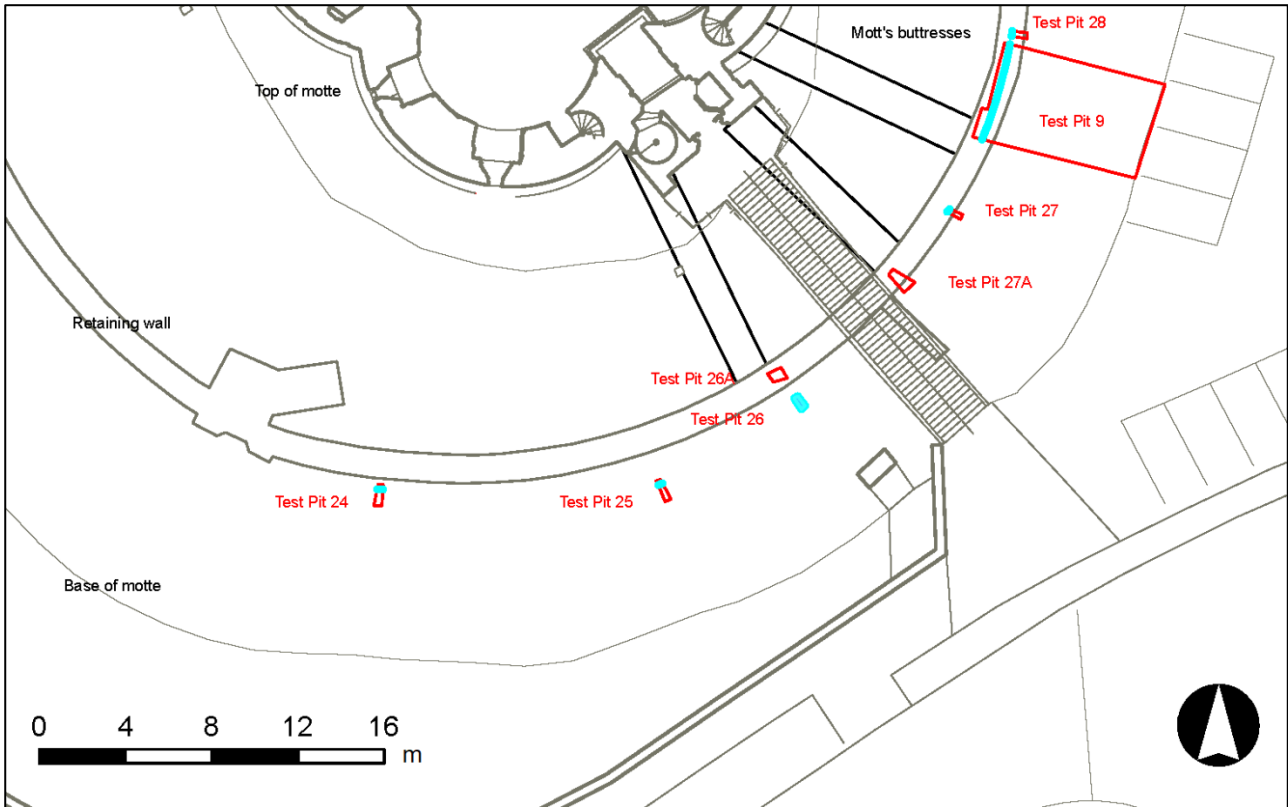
Plan showing location of retaining wall segments (blue) identified during excavation
